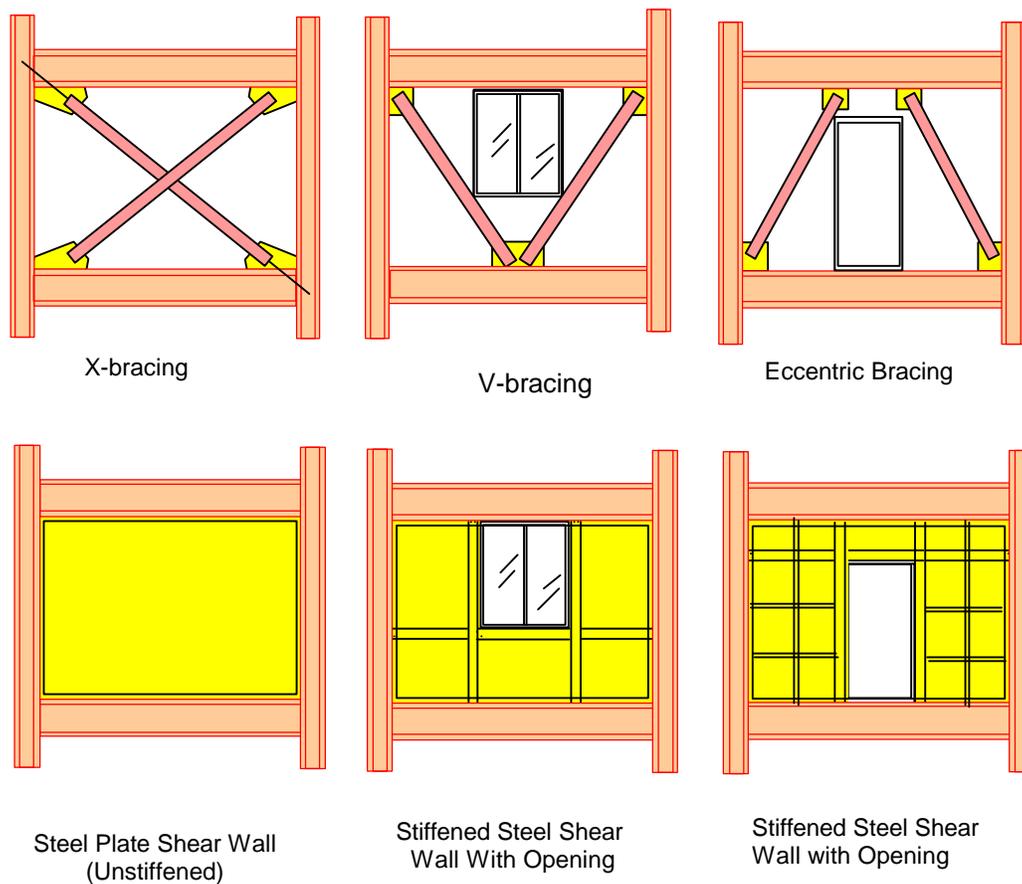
Three braced bays (top row) and same bays with steel shear walls
